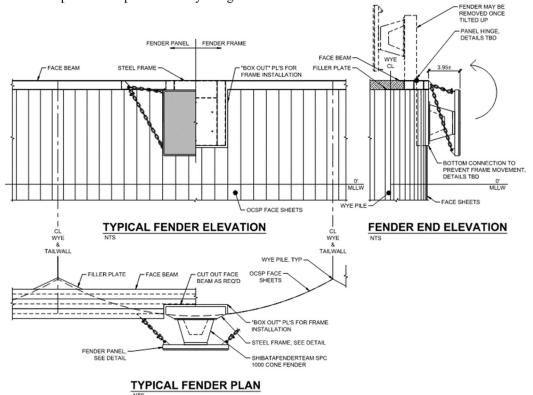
Hinged Tilt-up Fender – Plan and Elevation Views
